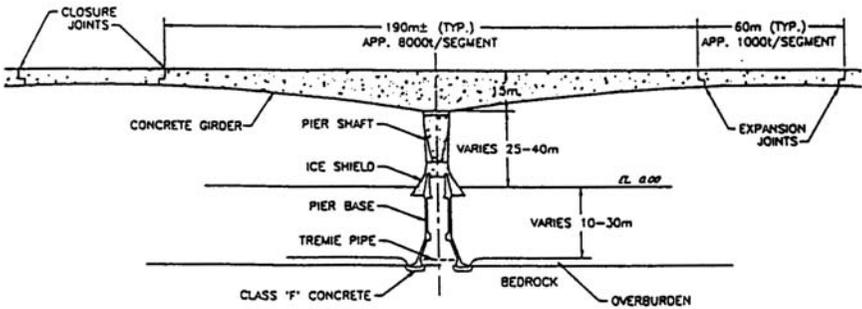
Typical foundation, pier shaft and span for the Northumberland Strait Bridge (1997) on the east coast of Canada.
